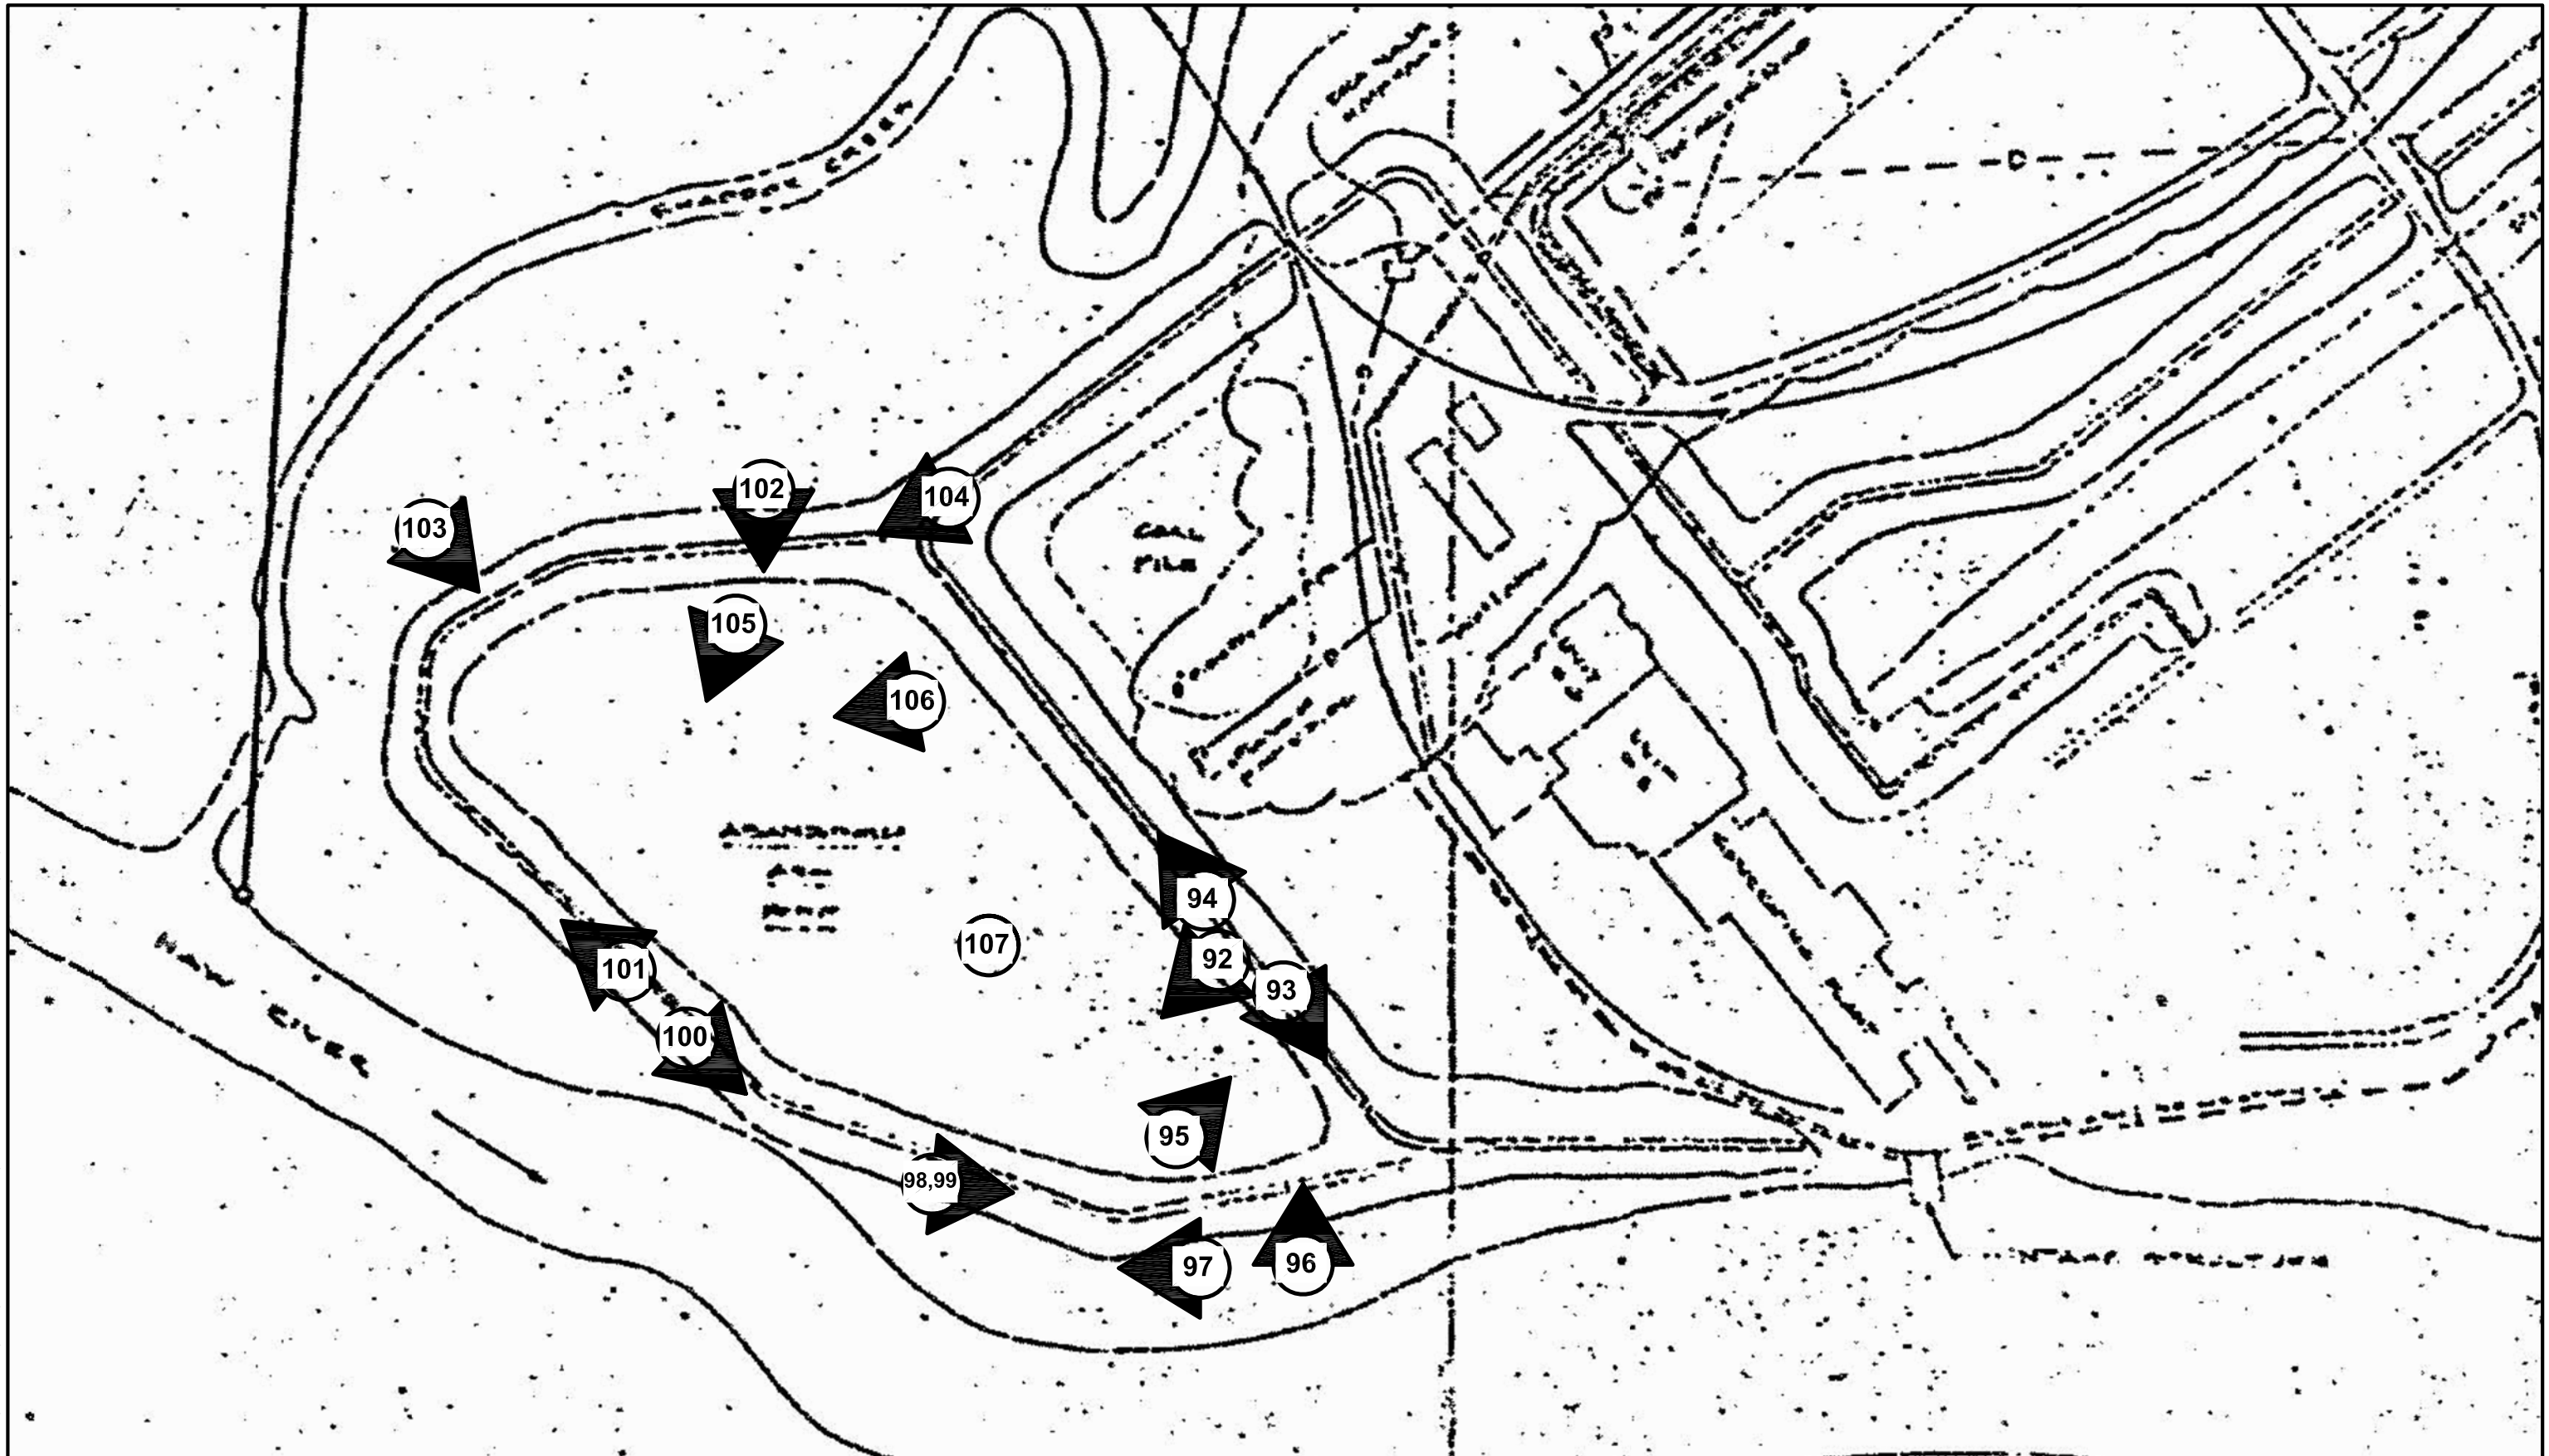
IMAGE REFERENCE: INDEPENDENT CONSULTANT INSPECTION, LAW (MACTEC), DECEMBER 1996, EXHIBIT NO. 1, CAPE FEAR STEAM ELECTRIC PLANT, NEW (1983) ASH POND, SITE PLAN, CP&L DRAWING NO. D-3336
